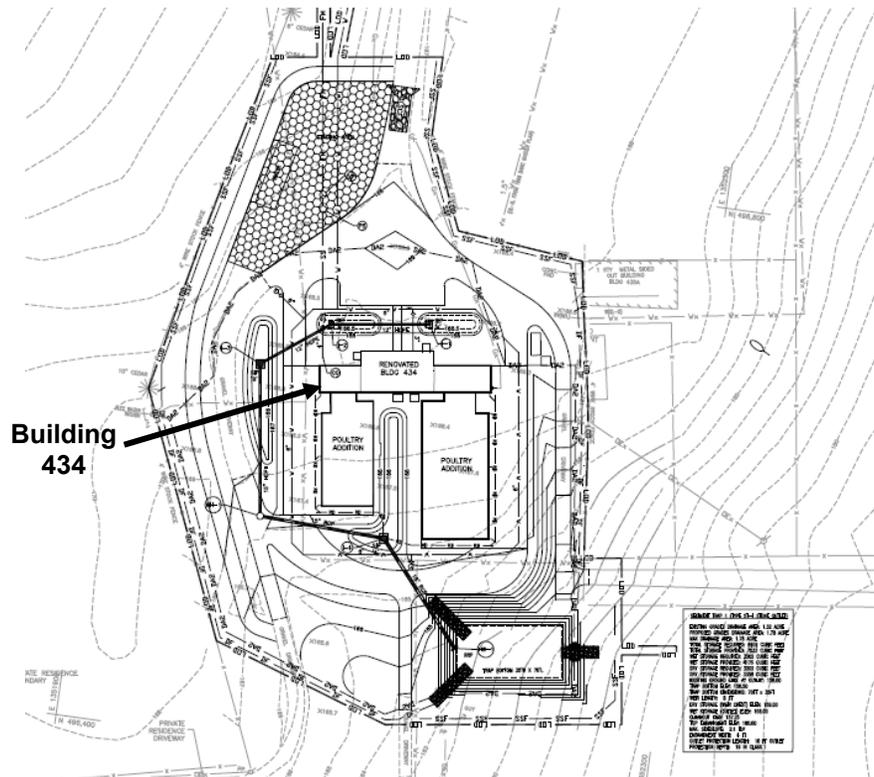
Site Plan for the proposed Poultry Quarantine House (Building 434)
